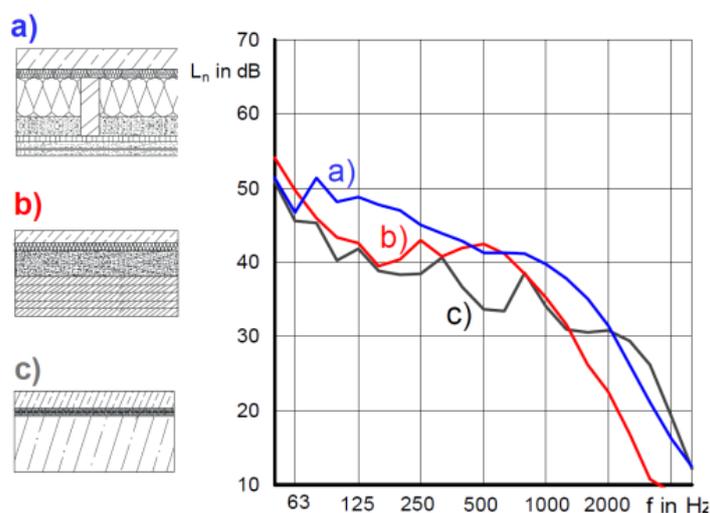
[7]. L_n of optimised wooden floors and of a concrete floor:
